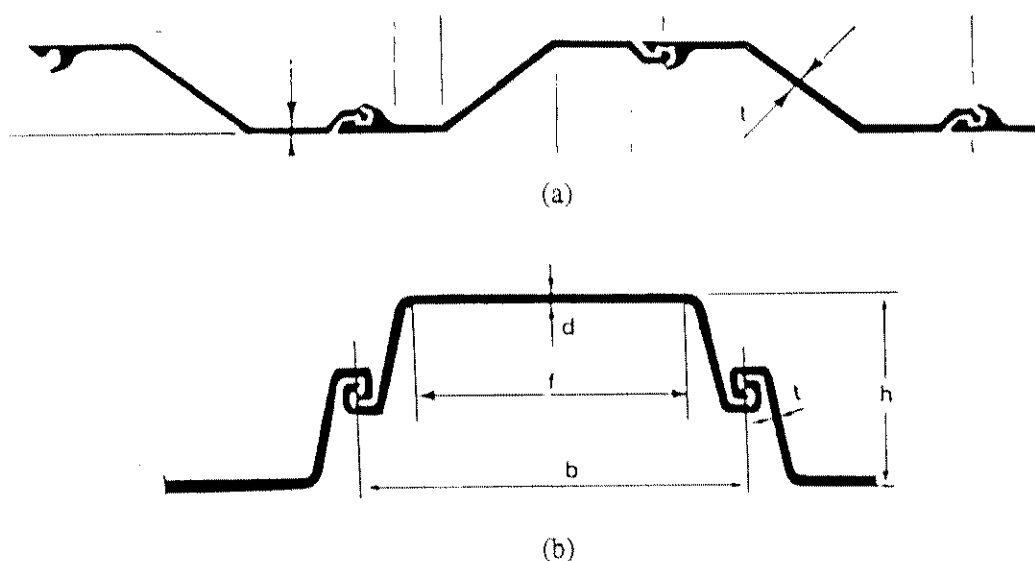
Cross-sections of British Steel Co. patented piles: (a) Frodingham, and (b) Larssen.
